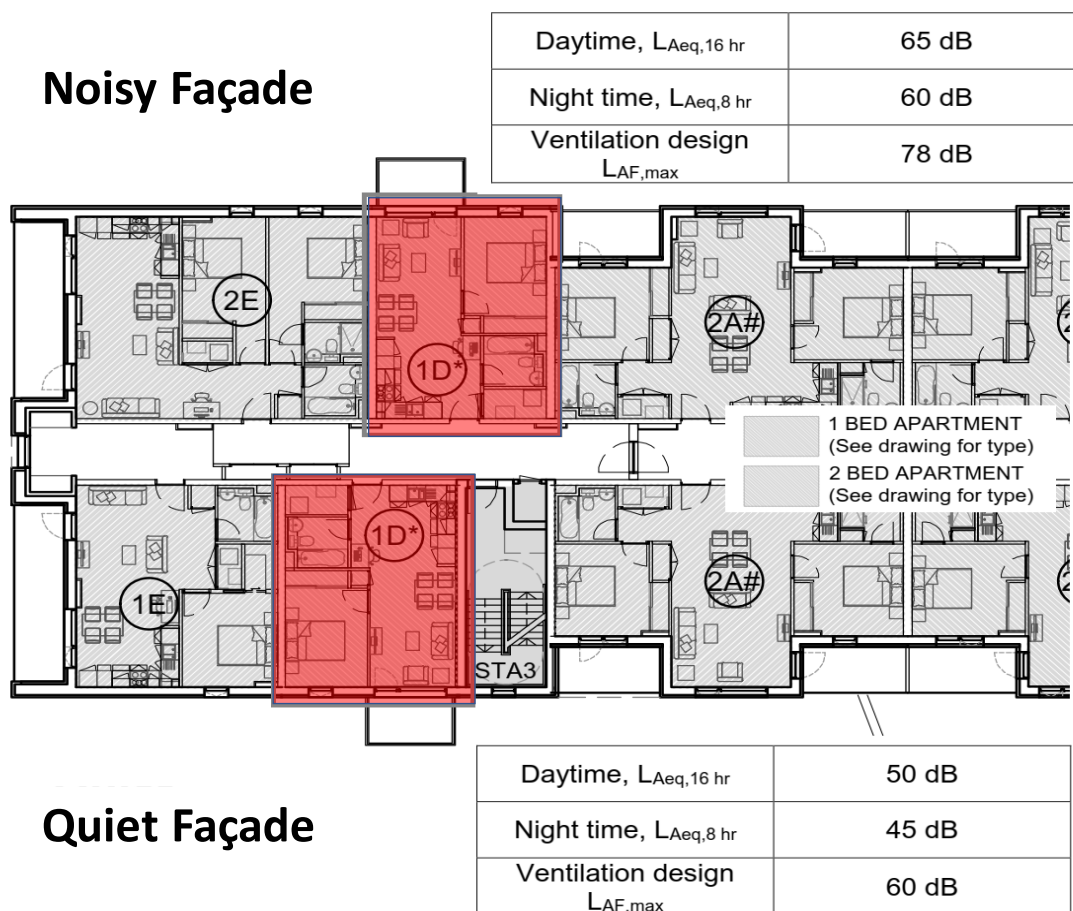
Building Plan (not to scale) indicating the two dwellings to be assessed and the relevant façade noise levels
